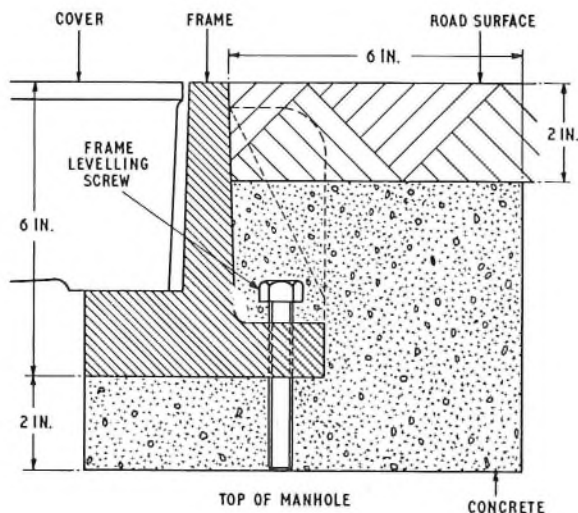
SECTION THROUGH UNIT-TYPE FRAME AND COVER WITH CONCRETE USED AS SETTING MEDIUM
